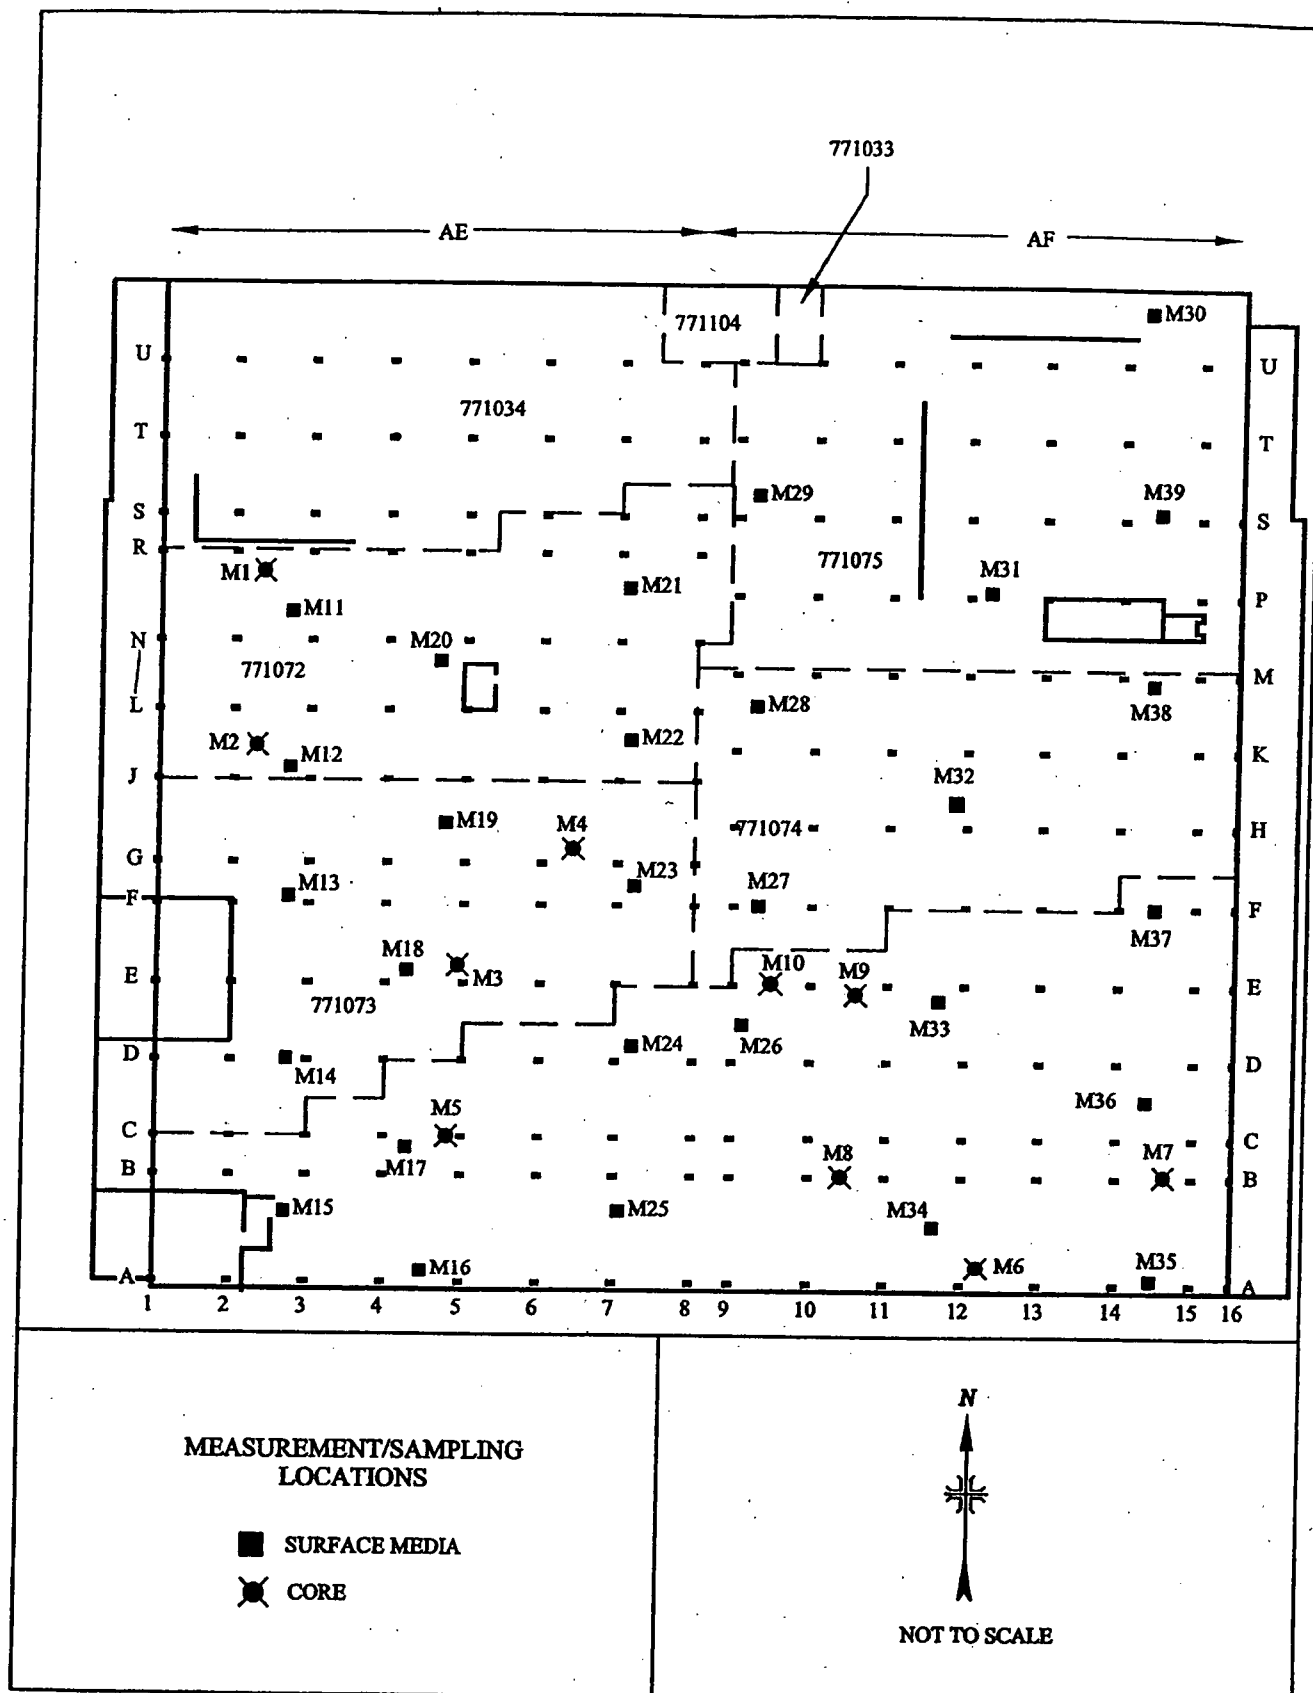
Building 771, First Floor (Areas AE and AF) - Core and Surface Media Sample Locations
